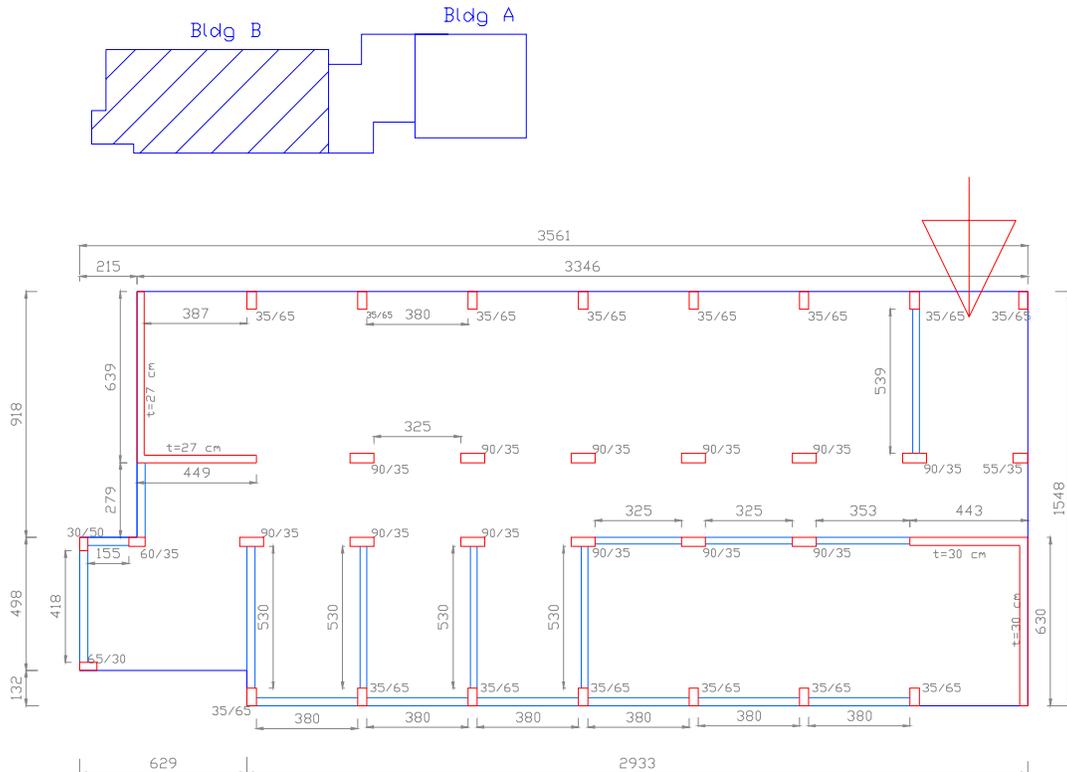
Structural floor plan for building C-14-08. The thickness of interior and exterior masonry walls were 0.25m and 0.3 m, respectively. The arrow shows the entrance to the building. Dimensions are in cm.
